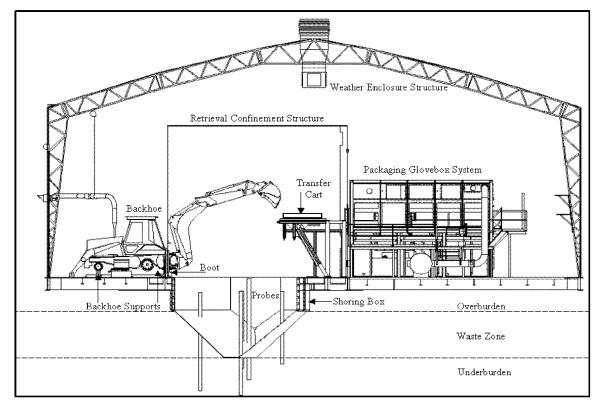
Cross section of the OU 7-10 Glovebox Excavator Method Project facility.
